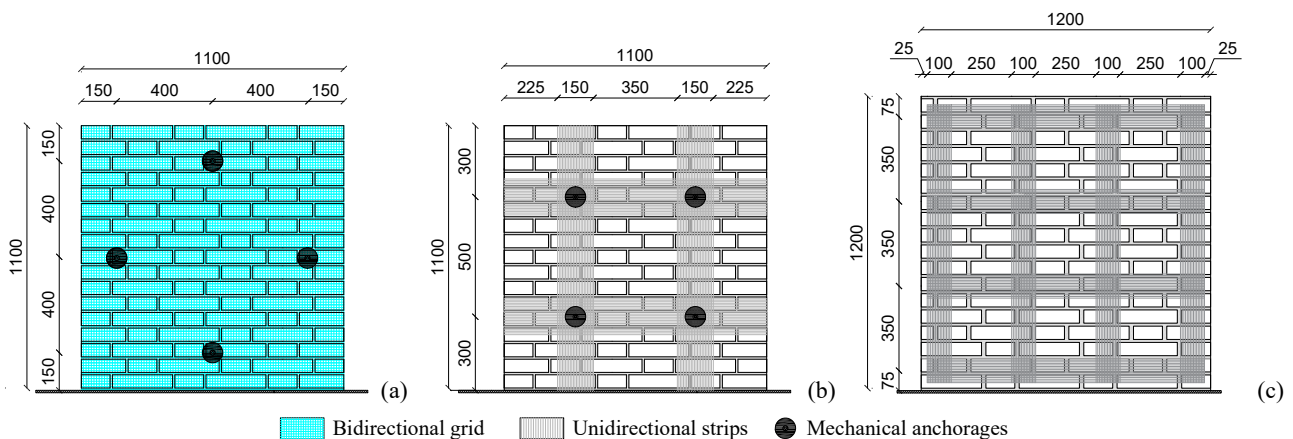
Strengthening layouts: (a) continuous layout; (b) discontinuous layout used for the masonry typology *A*; (c) discontinuous layout used for the masonry typology *B*.
